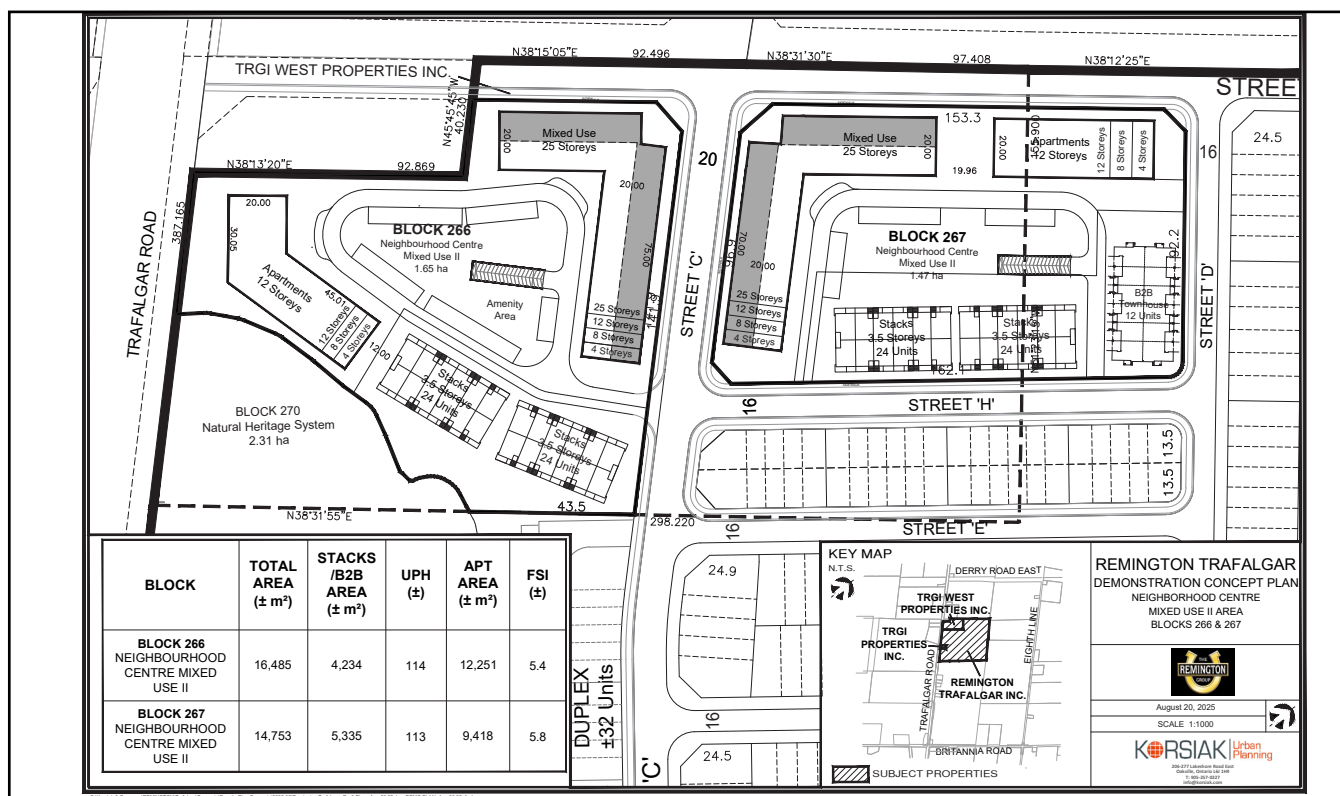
DEMONSTRATION CONCEPT PLAN FOR BLOCKS 266 & 267
